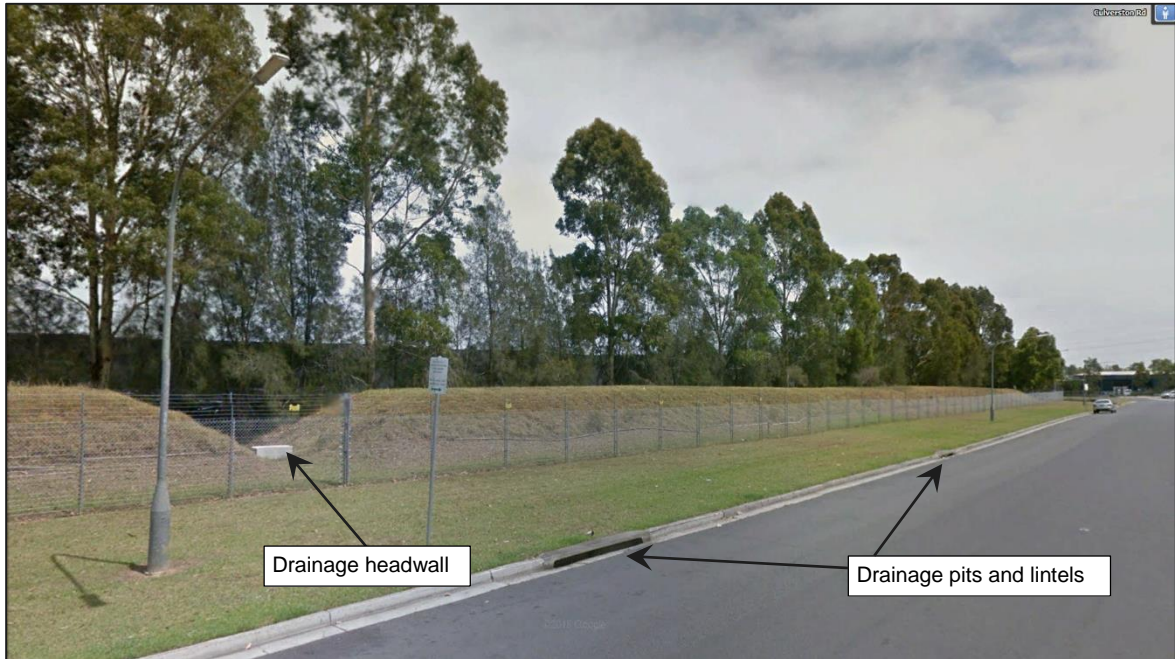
Existing drainage structures on Culverston Road (Google street view)
